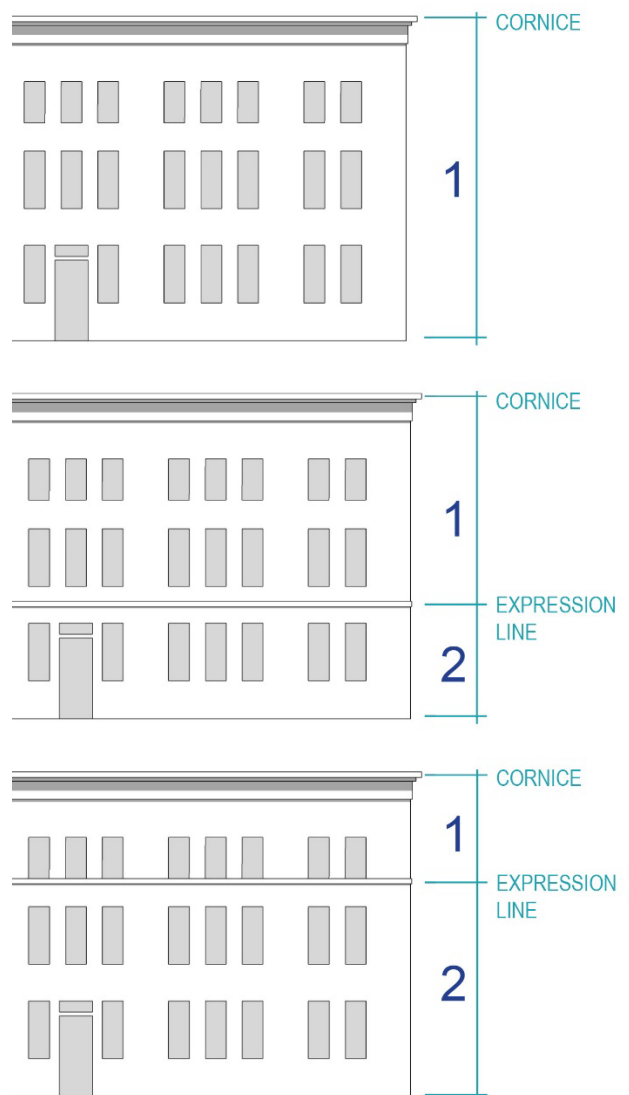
f.1.i: Facades divided into 1 and 2 horizontal layers.
